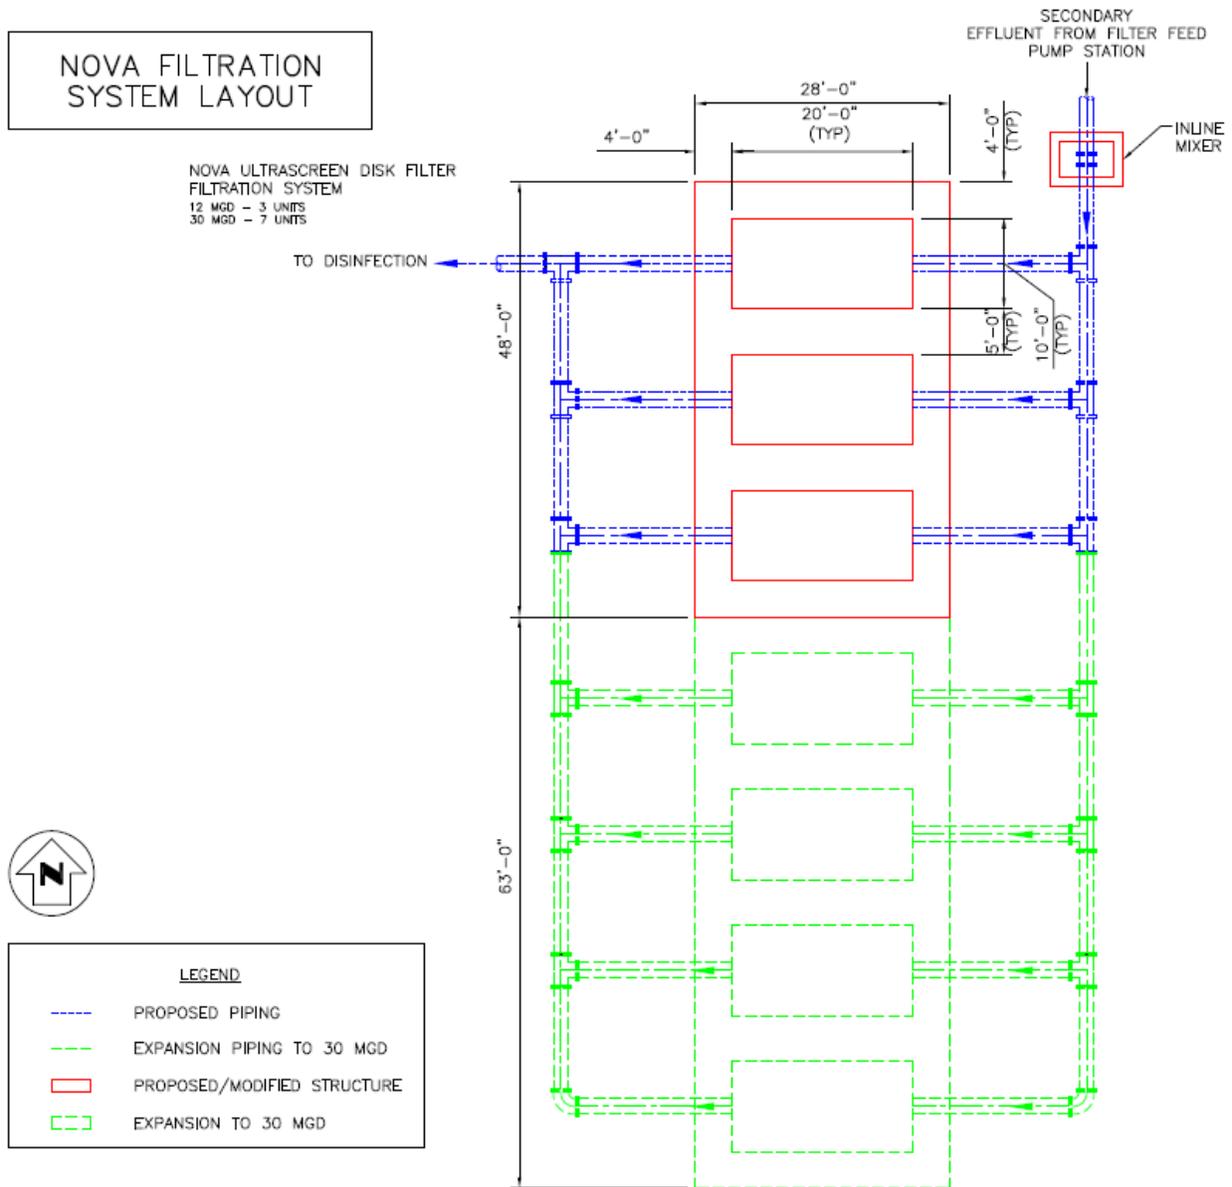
Plan C Nova Ultrascreen Filter Preliminary Layout
